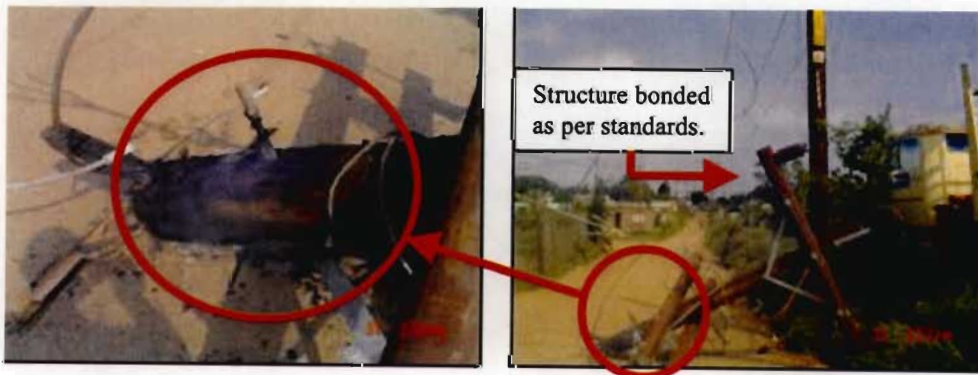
10: A burning bonded wood pole with smoke exiting a threaded rod hole.
